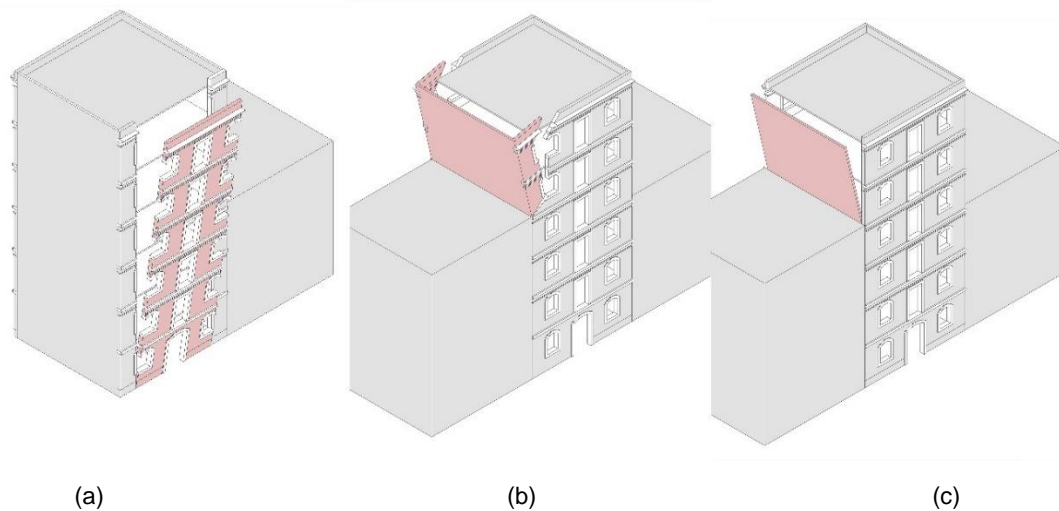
Local mechanisms: (a) Vertical strip overturning in the front facade, (b) Overturning of the orthogonal wall with two side wings, (c) Overturning of the orthogonal wall
